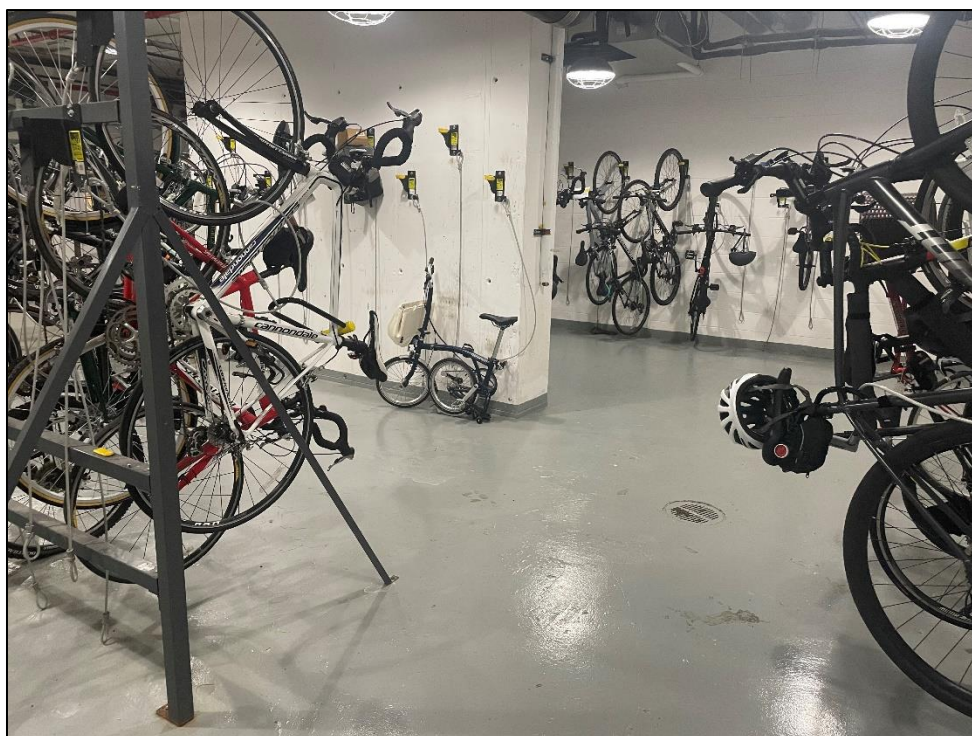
, 05/17/2023: View of composite cover in bicycle storage room (facing northwest).
